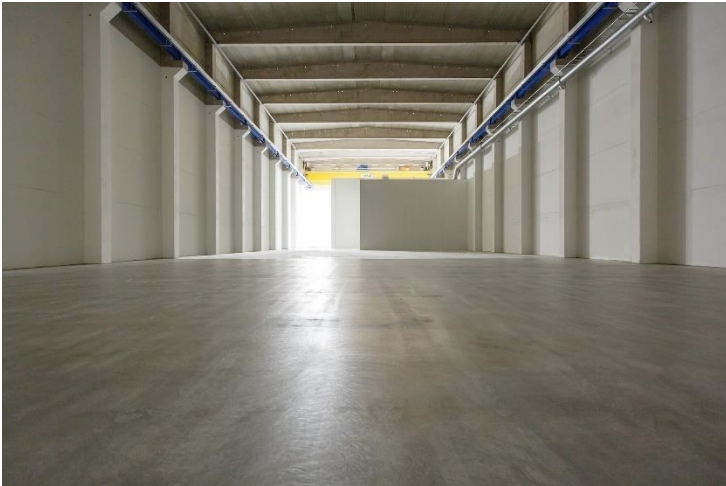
New storage building for RW at Studsvik. (Courtesy of Svafo)
